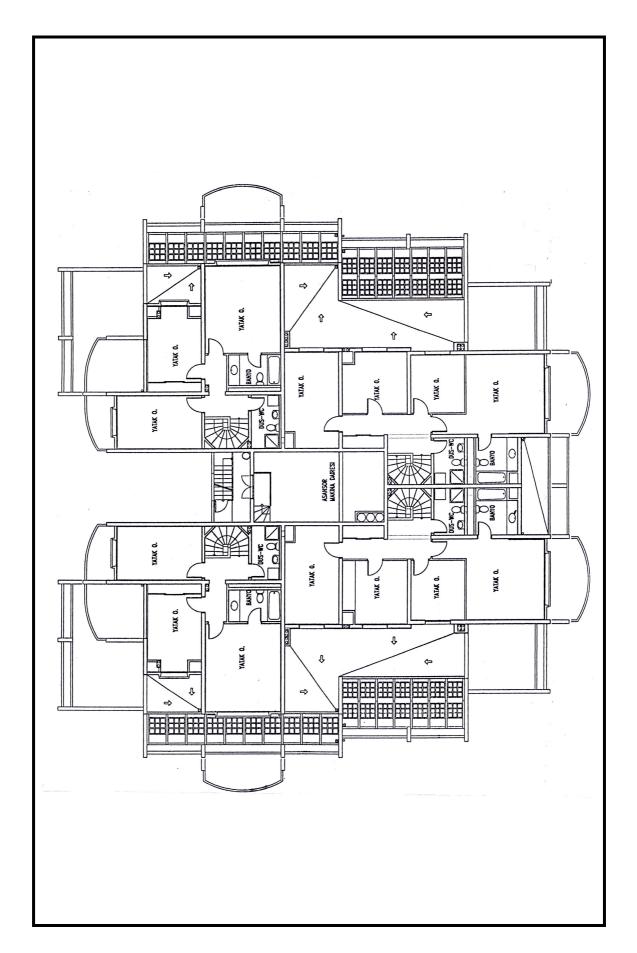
Mavişehir II; Albatros 21st-Floor Plan
